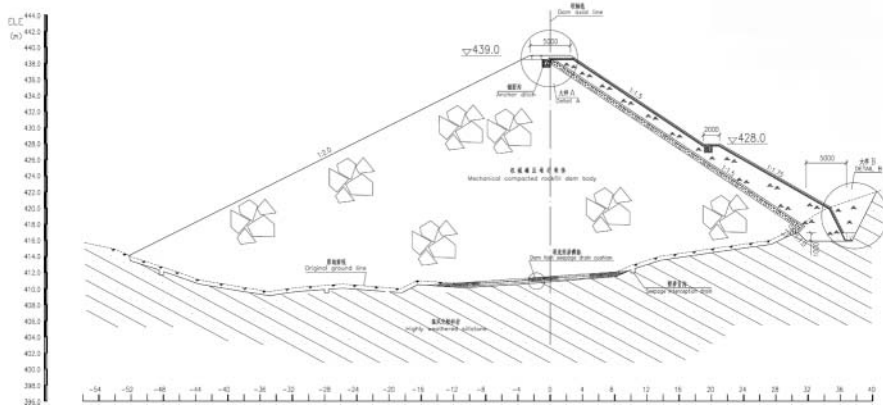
Section through CIL Tailings Storage Embankment (NERIN, June 2005)
